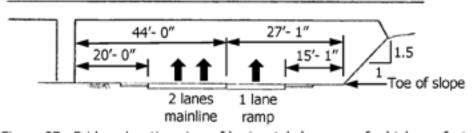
Bridge elevation view of horizontal clearances for highway feature carrying mainline and ramp traffic below the bridge.
